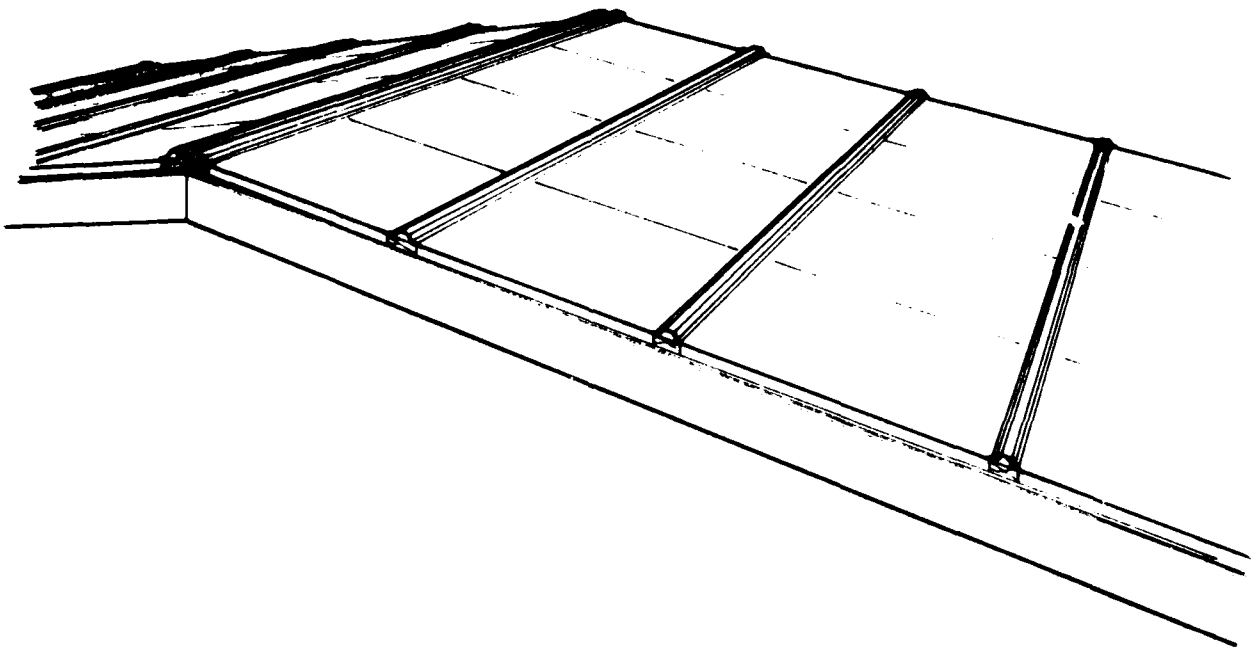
Purlins on sleepers applied directly to sloped built-up roof (shown with rigid insulation boards laid between purlins).
